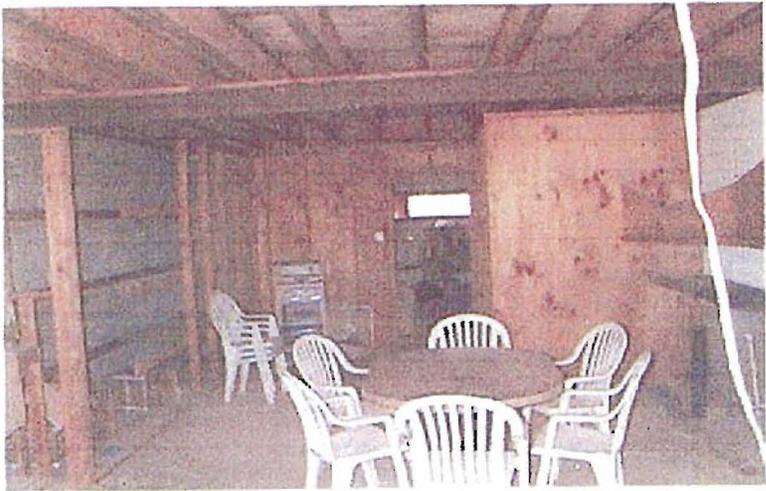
Taken 8/19/98 by J. Mur. Shows interior of building on the Eagle 1 claim.
